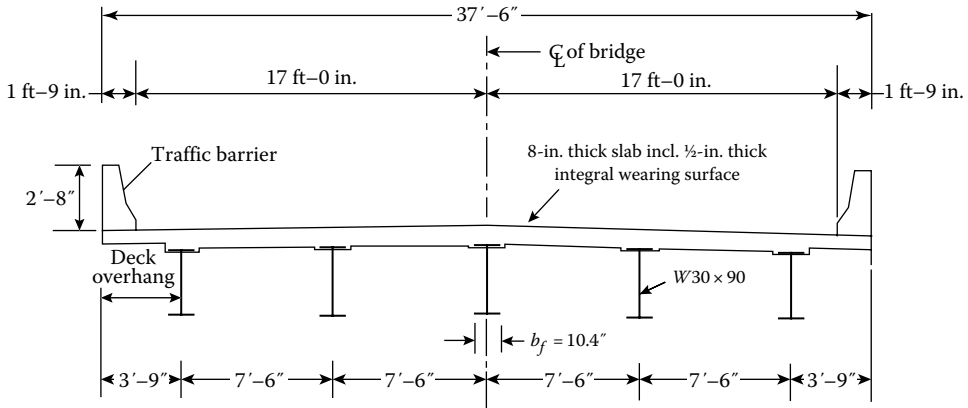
Cross section of slab-steel girder superstructure of Example 6.10.
